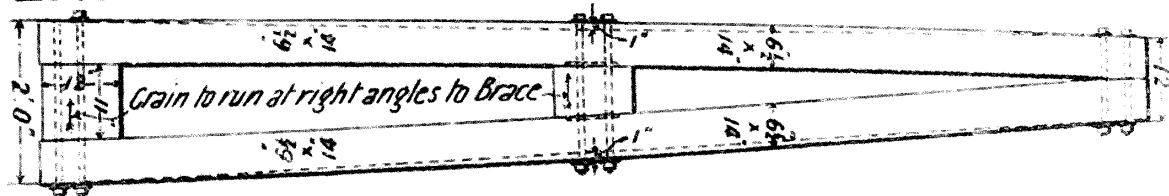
Plan of Principal with Spacer Orientation in 90' Allan Truss at Vacy
